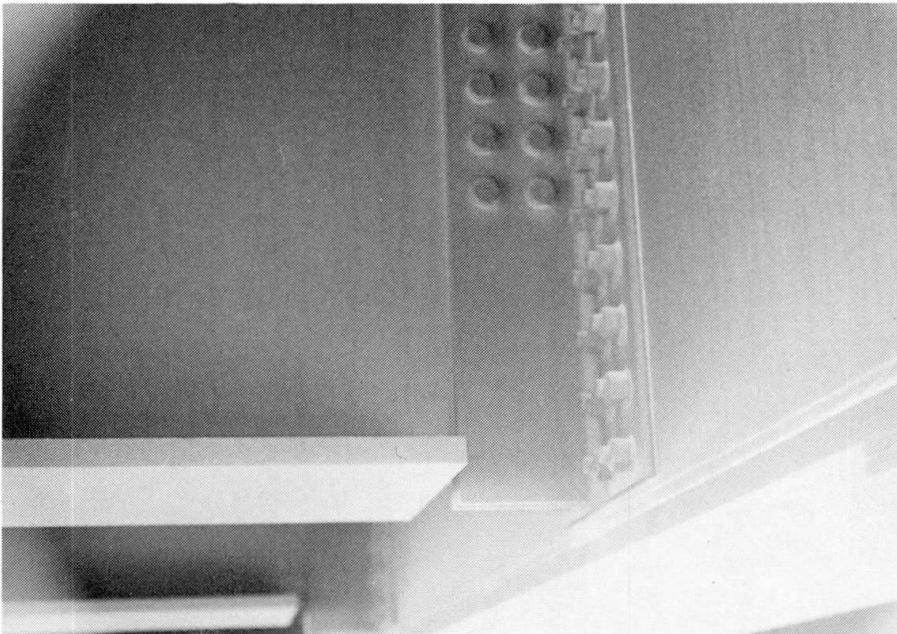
Longitudinal Girder Not Bolted Full Depth to the Connection Angles
